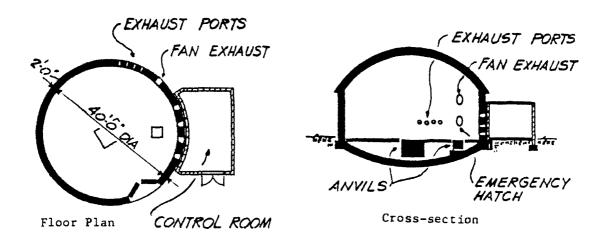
Circular Blast Chamber with Domed Roof and Foundation (Ref. 15)
